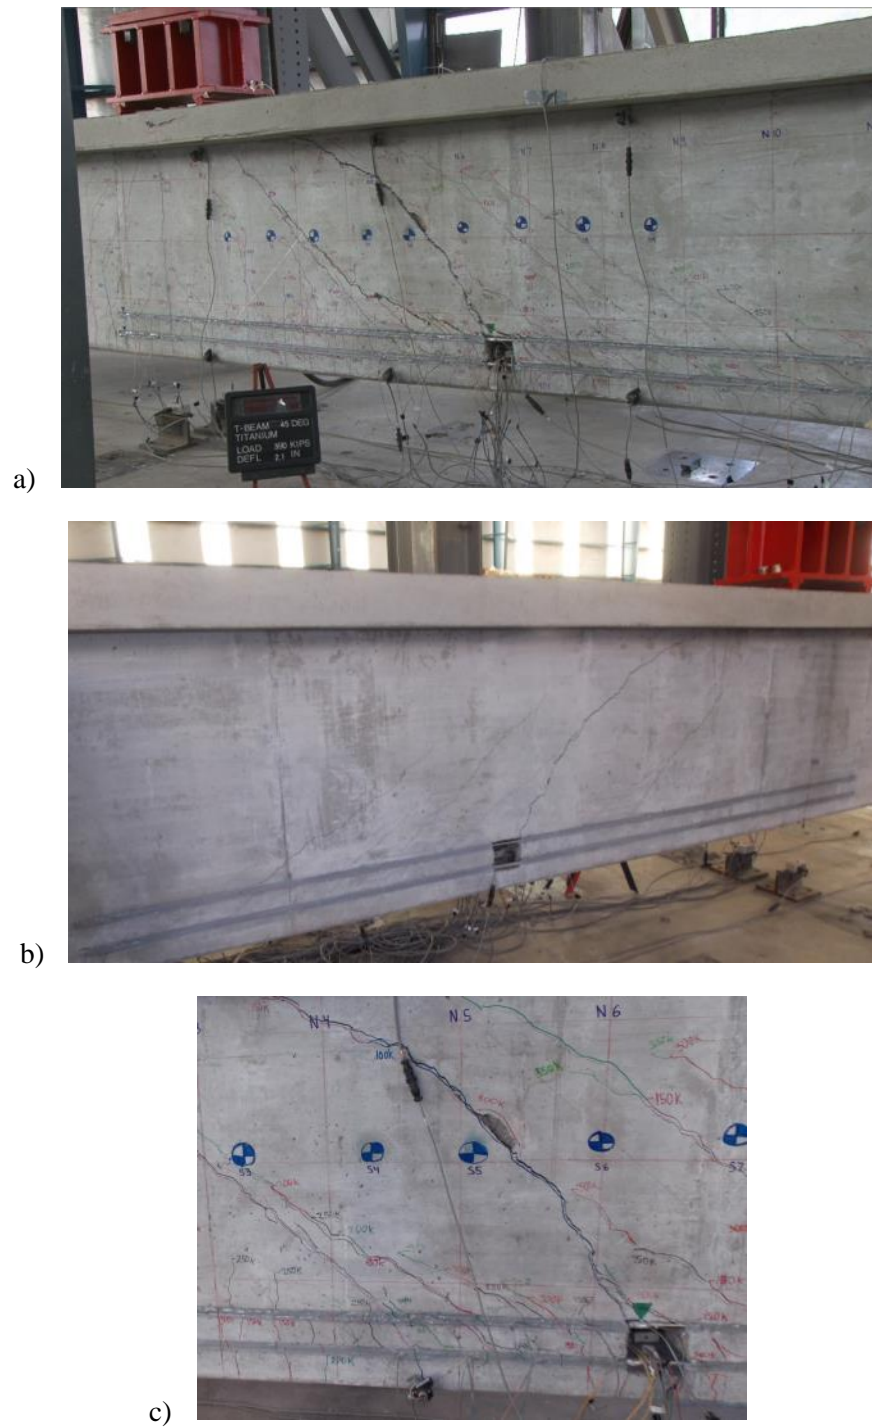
Specimen T.45.Ld3(10) at failure a) front, b) back, and
